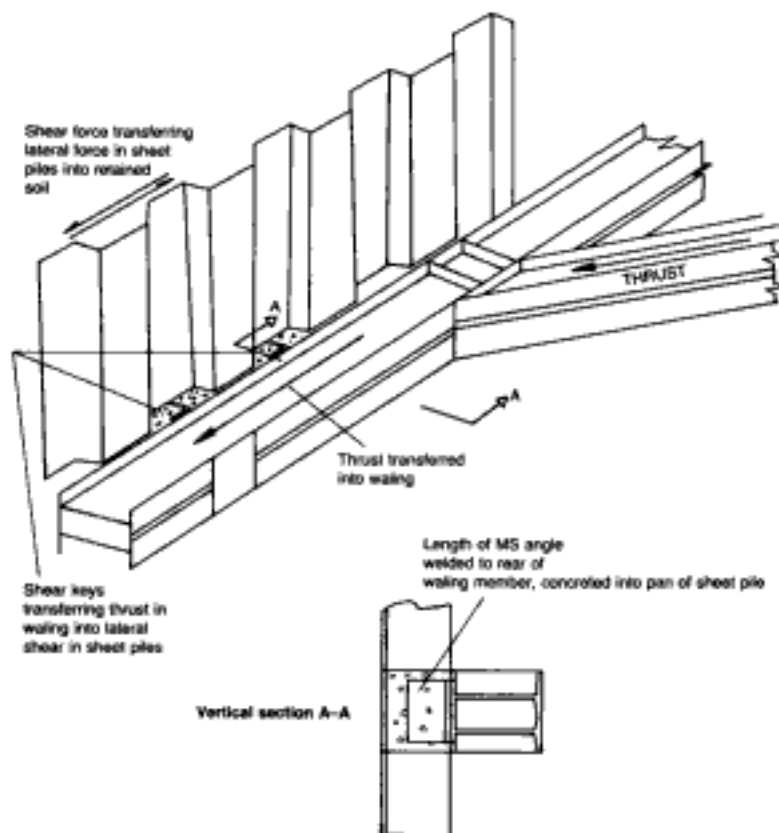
Sheet piled cofferdam construction: shear keys at rear of waling transfer thrust from diagonal strut into short waling length and through sheeters into soil at rear of piles
